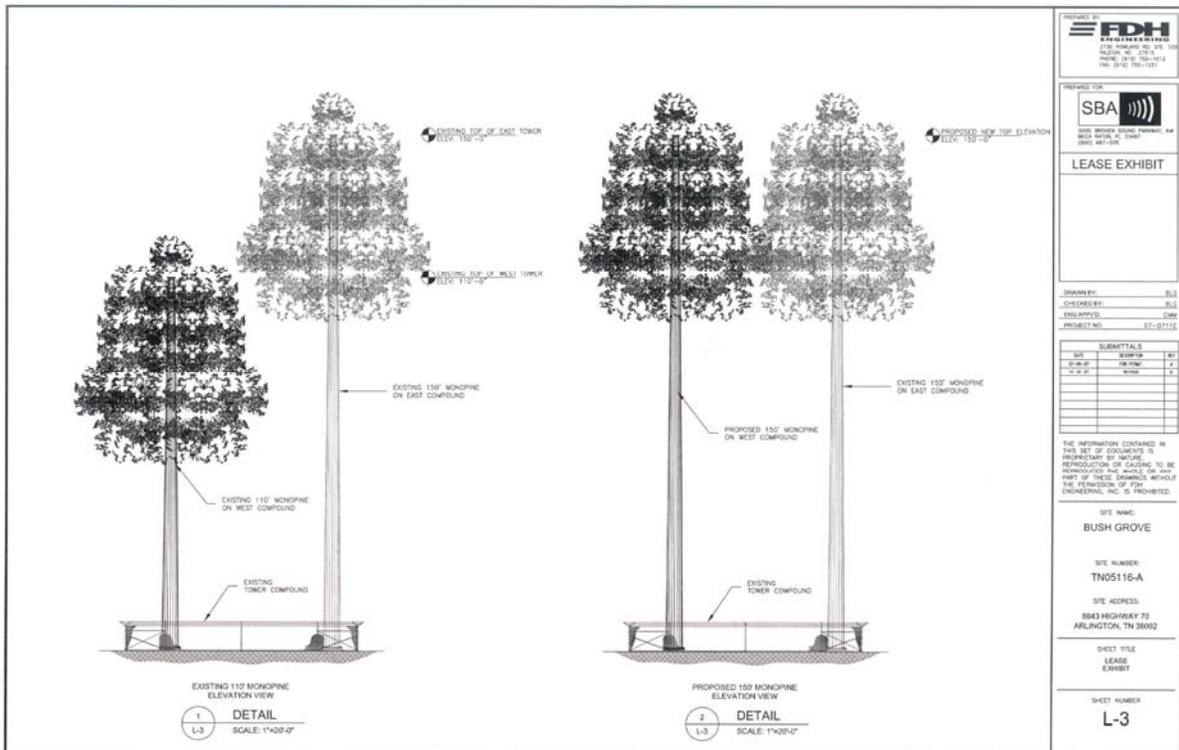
PROPOSED PROFILE AFTER IMPROVEMENT
